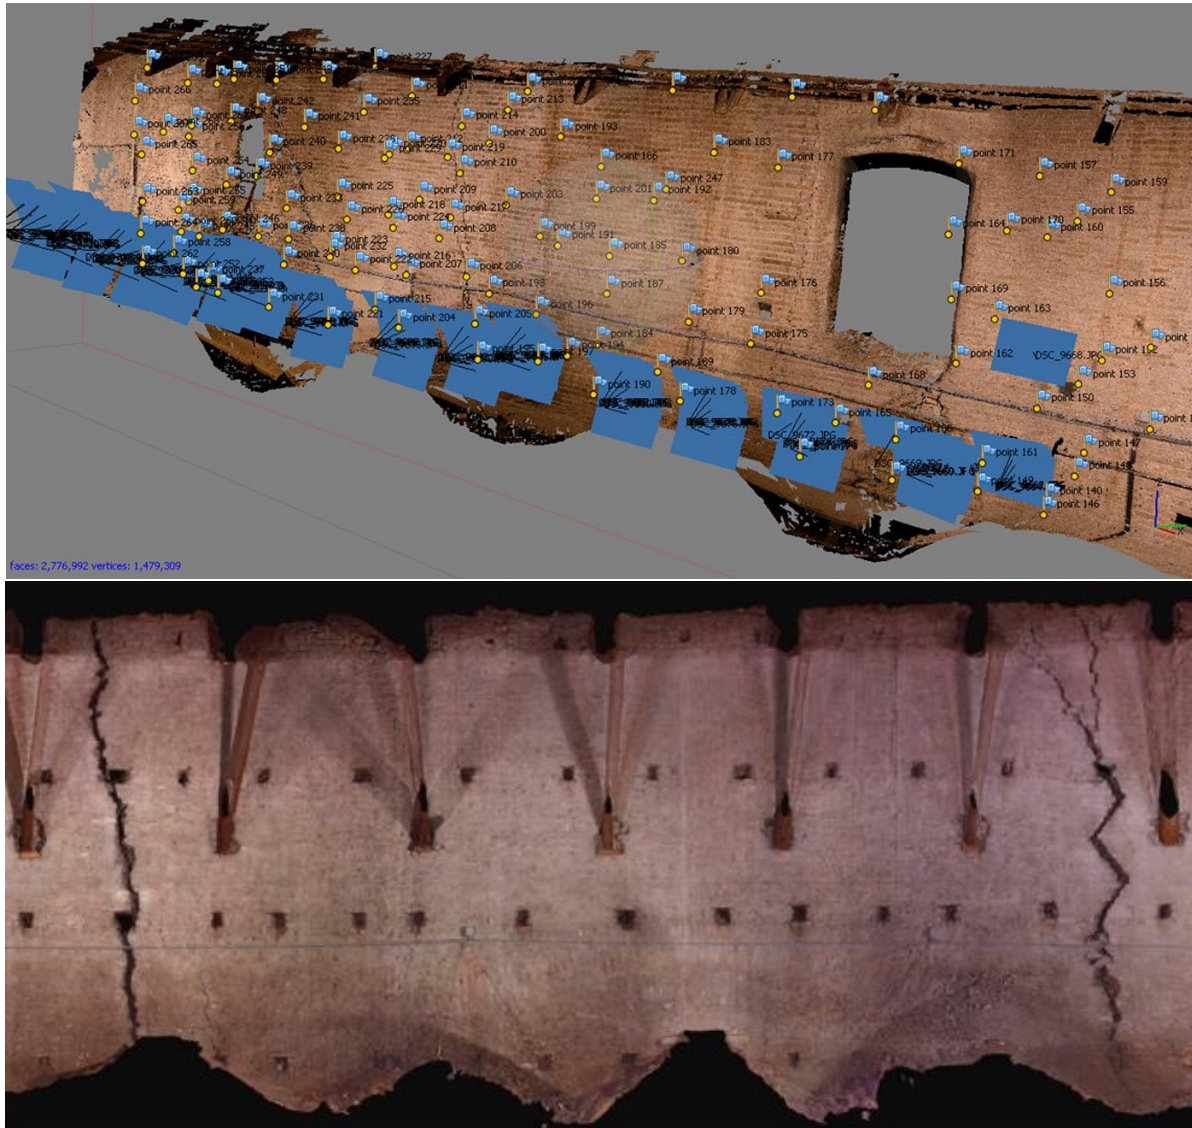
Above, imaging geometries and, below, an example of damaged wall portion.
